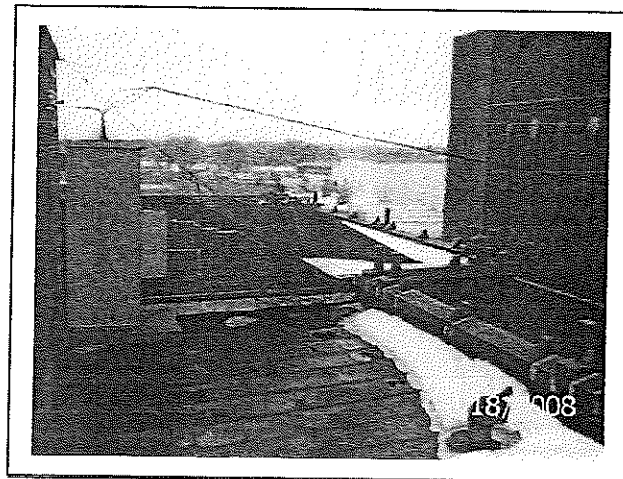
Viewing asbestos-containing roofing felt, East side of building.
